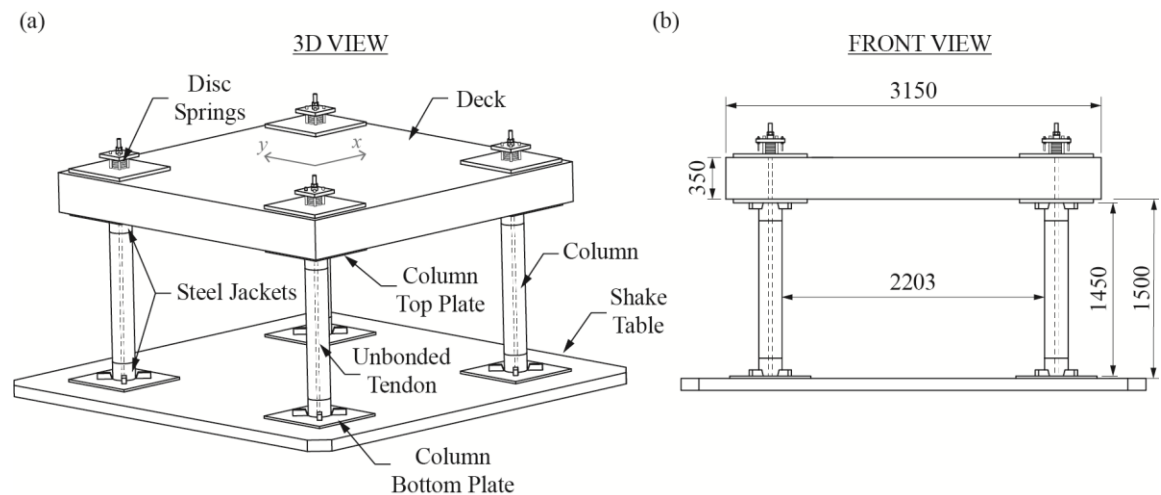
Schematic drawing of the specimen in (a) 3D View, and (b) Front View.
